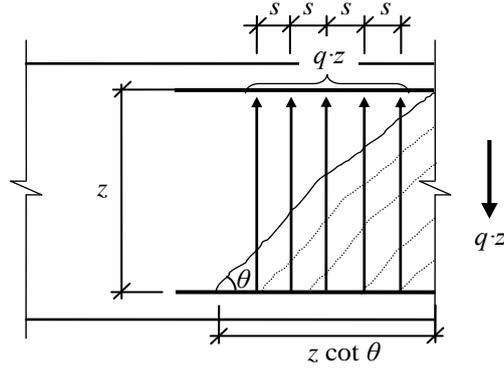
Truss model for derivation of needed amount of transverse torsional reinforcement.
